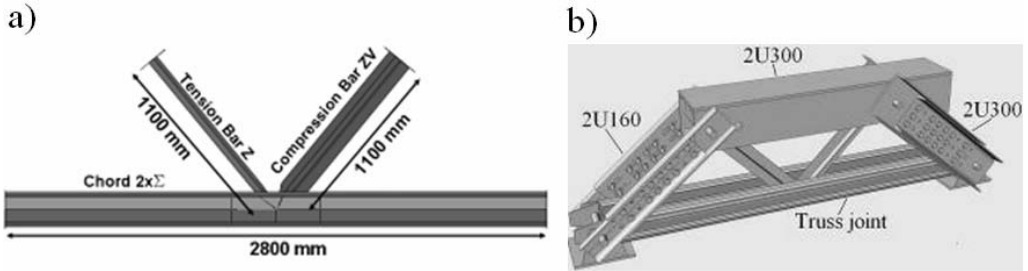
Dimensions of truss cutting containing joint (a) and frame system (b).
